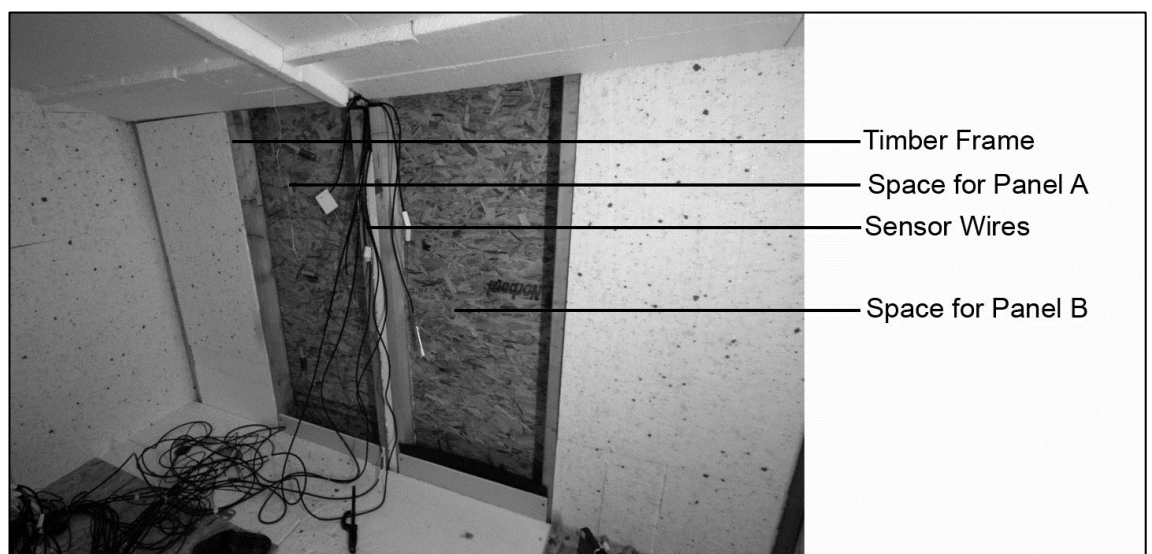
Installation of the EPS insulation in the eastern wall.
